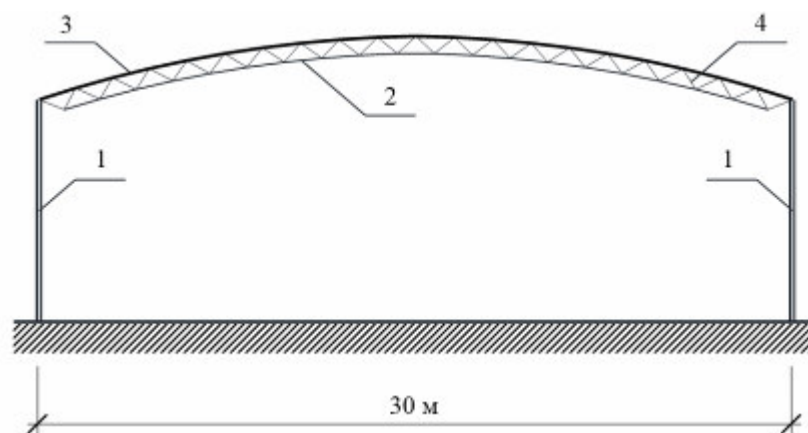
The steel and concrete grid-cable suspended composite shell:
